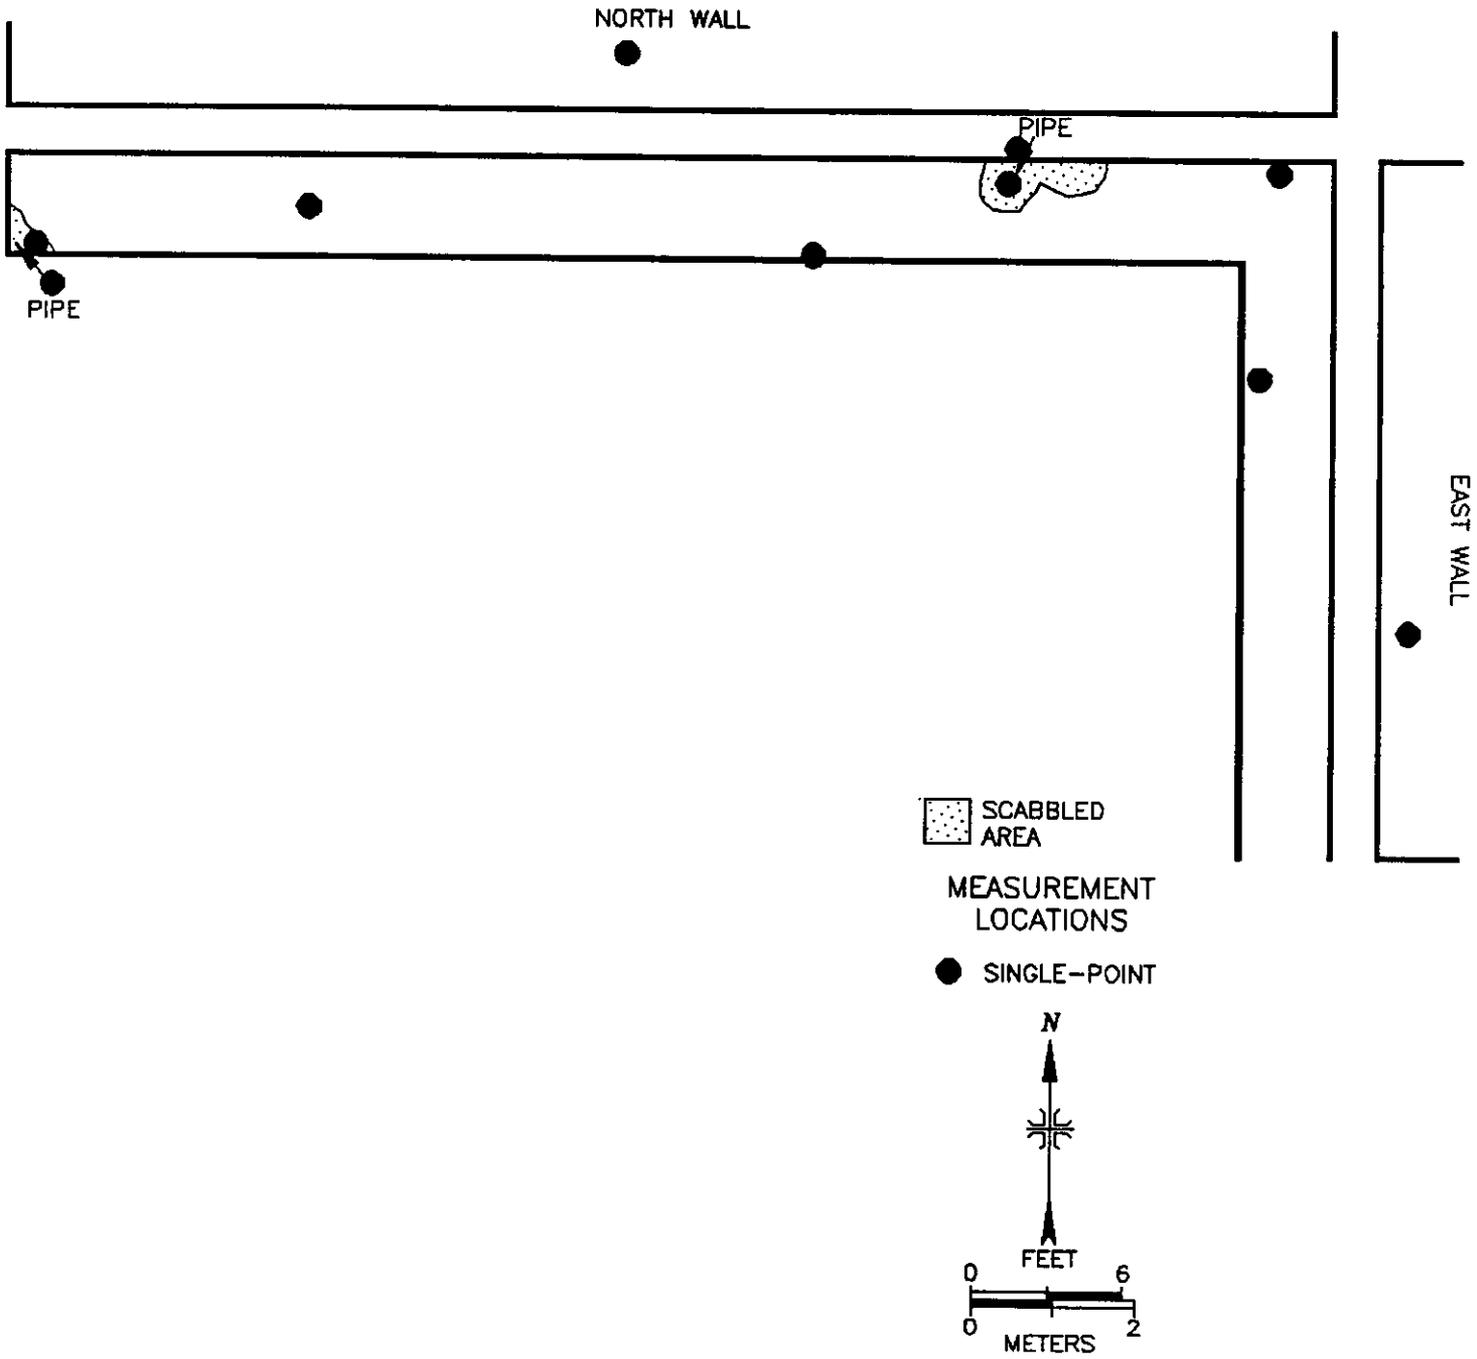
Building 23, Basement Tunnel, Indicating Measurement Locations
